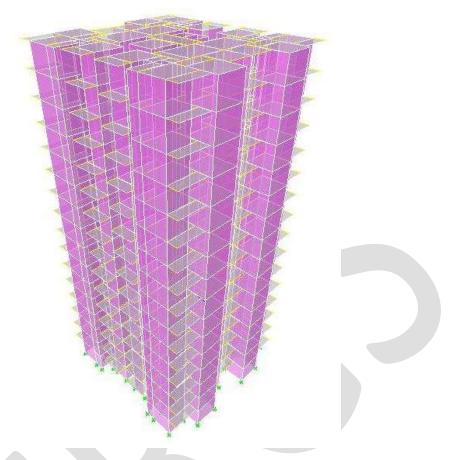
3D Model of G+15 Storied RC Structural Wall System Building
